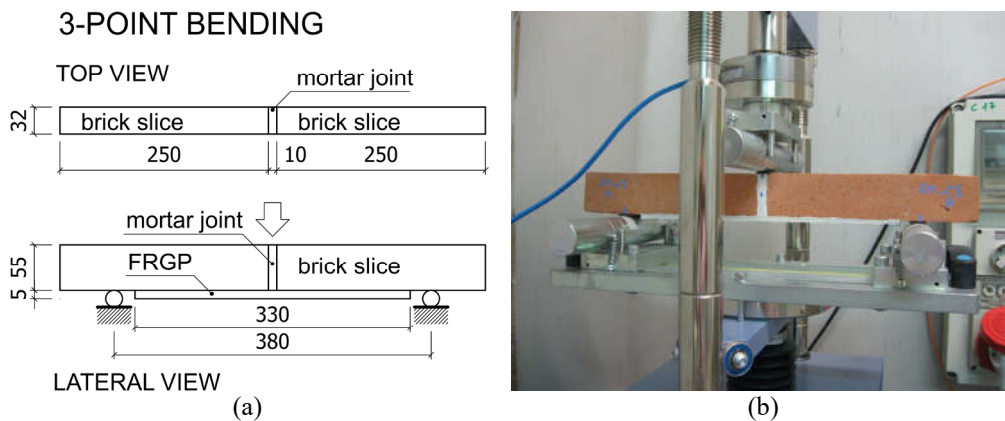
Sketch of a 3-point bending specimen, with dimensions in mm (a) and sample ready for testing (b)
